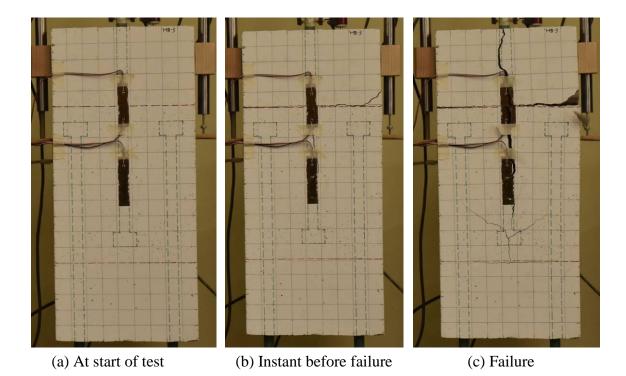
Pullout Specimen Before and After Failure – HB-3
